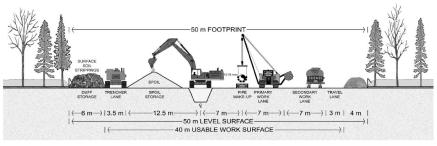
Cross-sectional View of the Right-of-Way and Work Space
